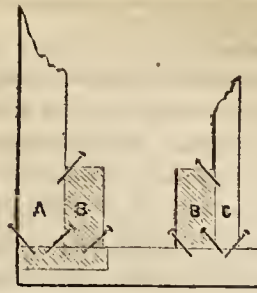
Elevation section—manner of nailing—A, corner stud, 4 by 4—B, Joist, 5 by 3—C, 2 by 4.
